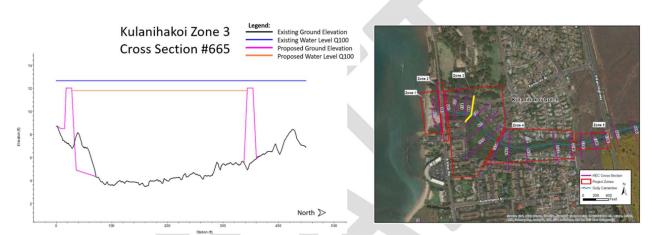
Kulanihakoi Channel Cross Section #665 (left) and Key Map (right, showing cross section in yellow).
